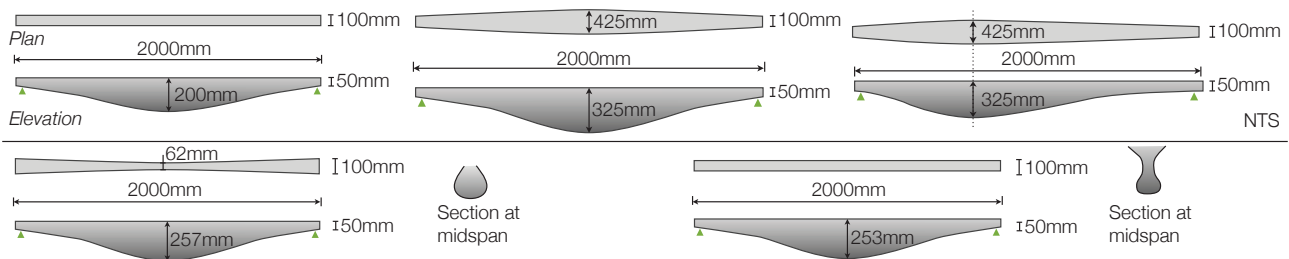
Beam profiles. Top (l-r) Baillis (2006): Beams 1 &amp; 2; 3 &amp; 4. Bottom (l-r) Garbett (2008): Beam 1; 2.
